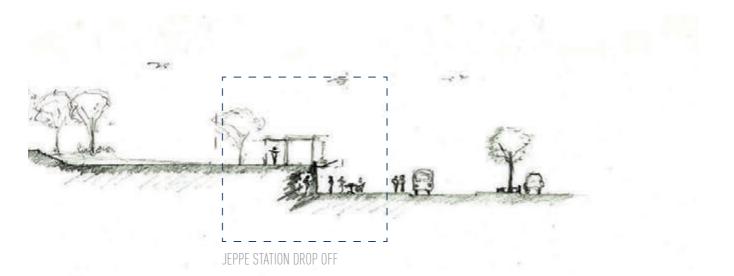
Section through railway line, plaza and new drop off area at staion
